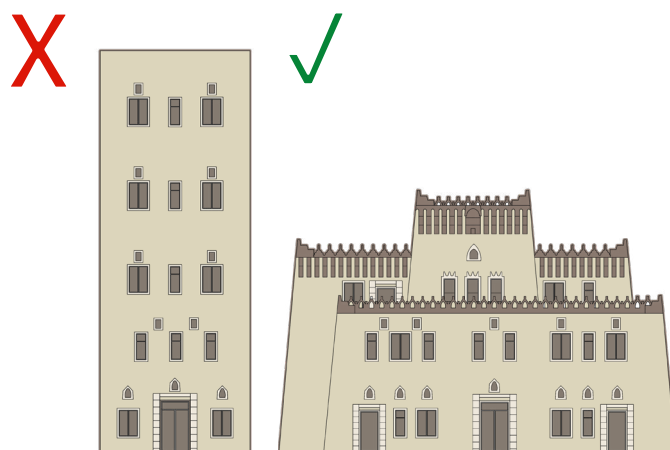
Break down building massing to better fit traditional elements of architectural character\
